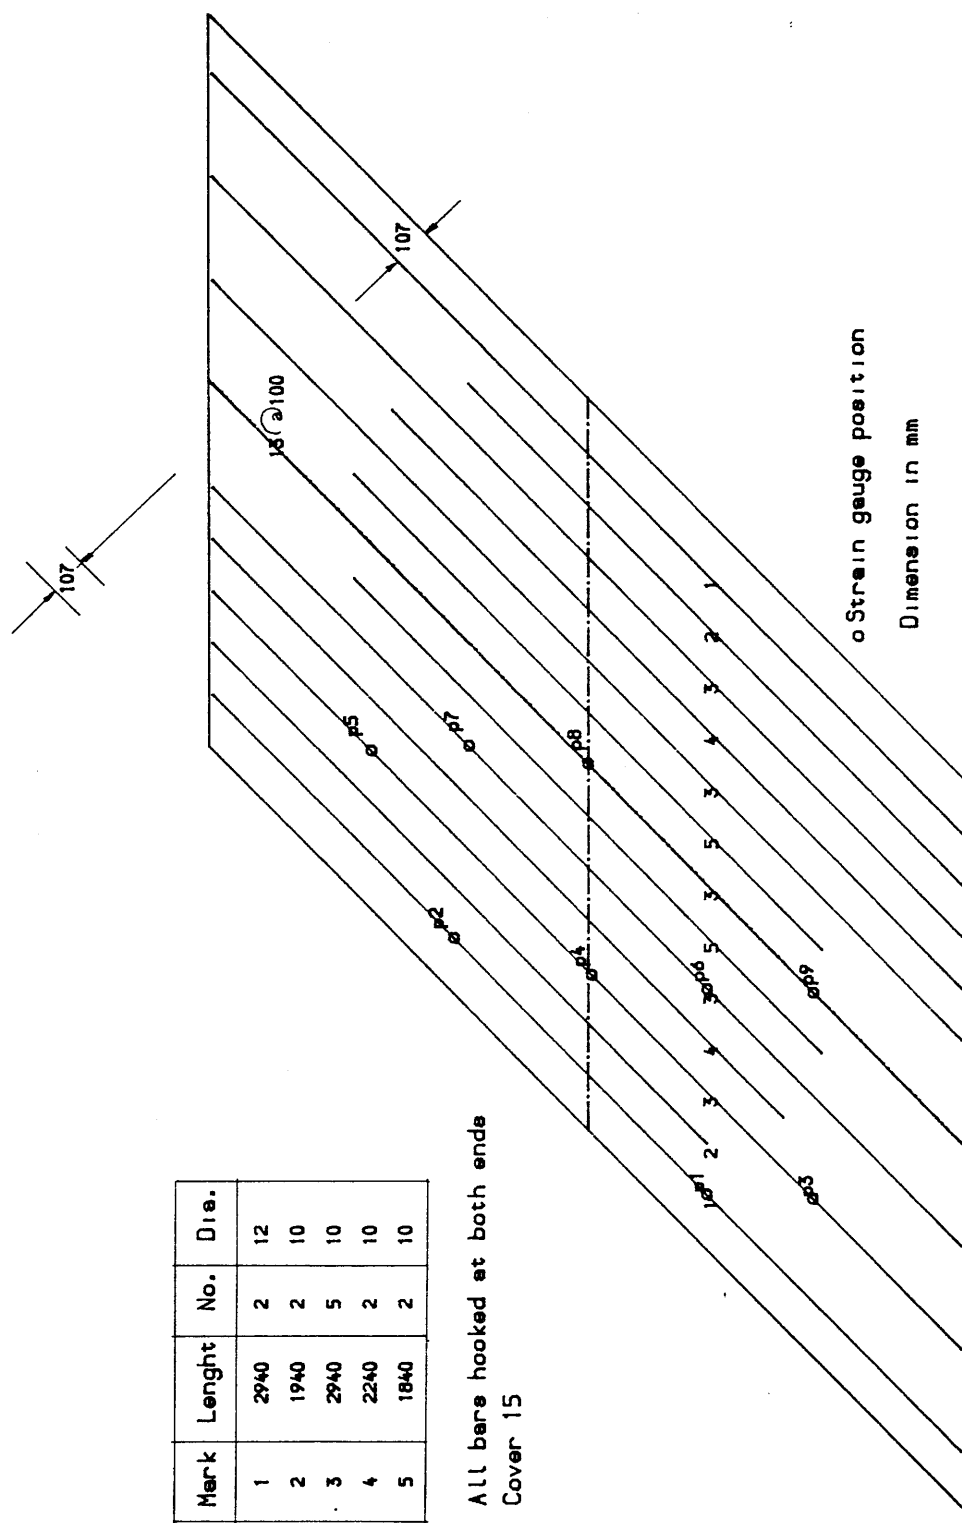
MODEL SKEW SLAB NO. (5) Details of bottom longitudinal steel parallel to the free edge and position of strain gauges.
